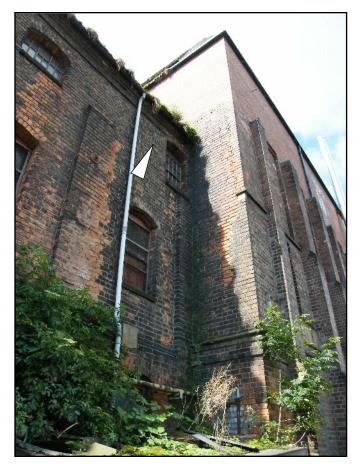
The south-east elevation of the maltings and the Malt Kiln House, viewed looking north.
